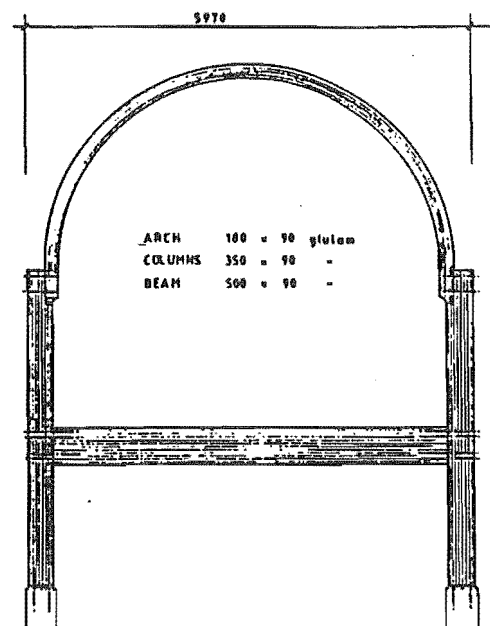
Epoxyed steel connections used in the entry hall of the sports centre (Buchanan and Fletcher, 1989)
